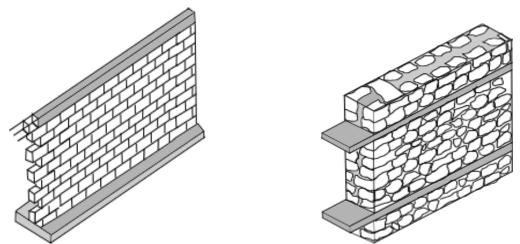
Masonry wall with horizontal tie beam (By Author)
